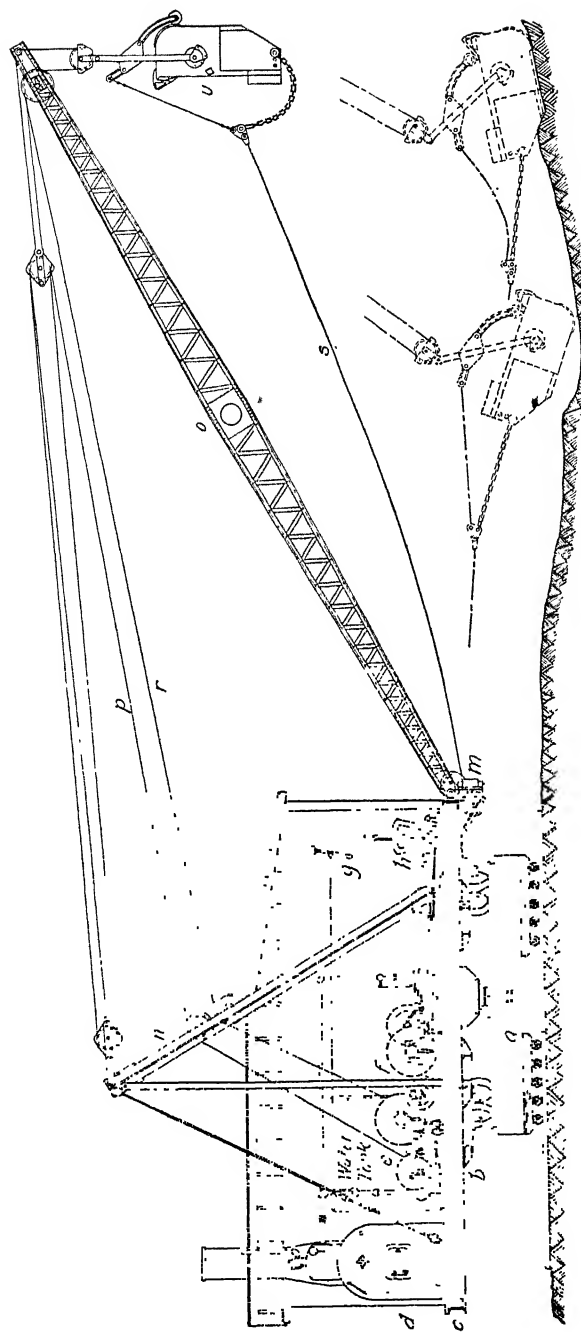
Detailed View of Scraper Bucket Excavator. *a*, Lower Frame; *b*, Turn Table; *c*, Upper Frame; *d*, Boiler; *e*, Hoisting Engine; *f*, Swinging Engine; *g* and *h*, Operating Levers; *m*, Fair Lead; *n*, A-Frame; *o*, Boom; *p*, Boom Fall Line; *r*, Hoisting Line; *s*, Drag Line; *u*, Bucket.
